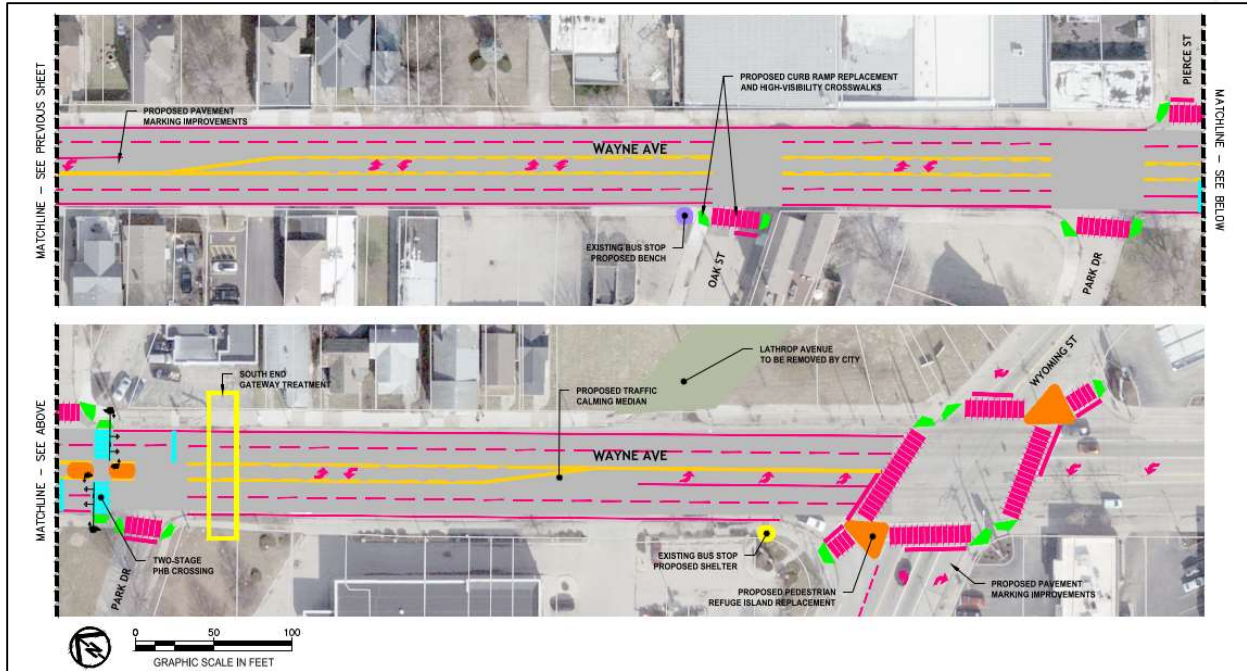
Proposed Conditions (2) Clover Street to Wyoming Street
